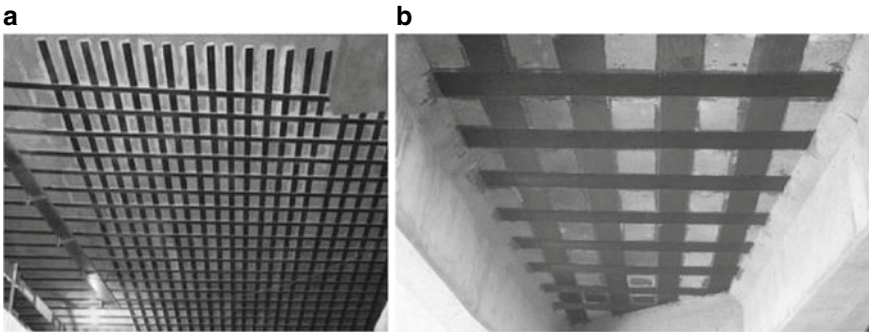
Retrofitting of a Bridge deck panel, b RC slab
